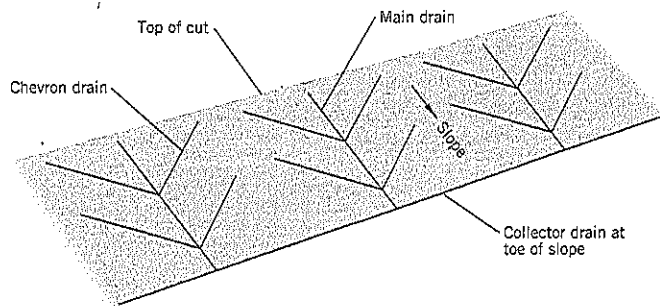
Typical chevron layout of french drains on a cut slope.
